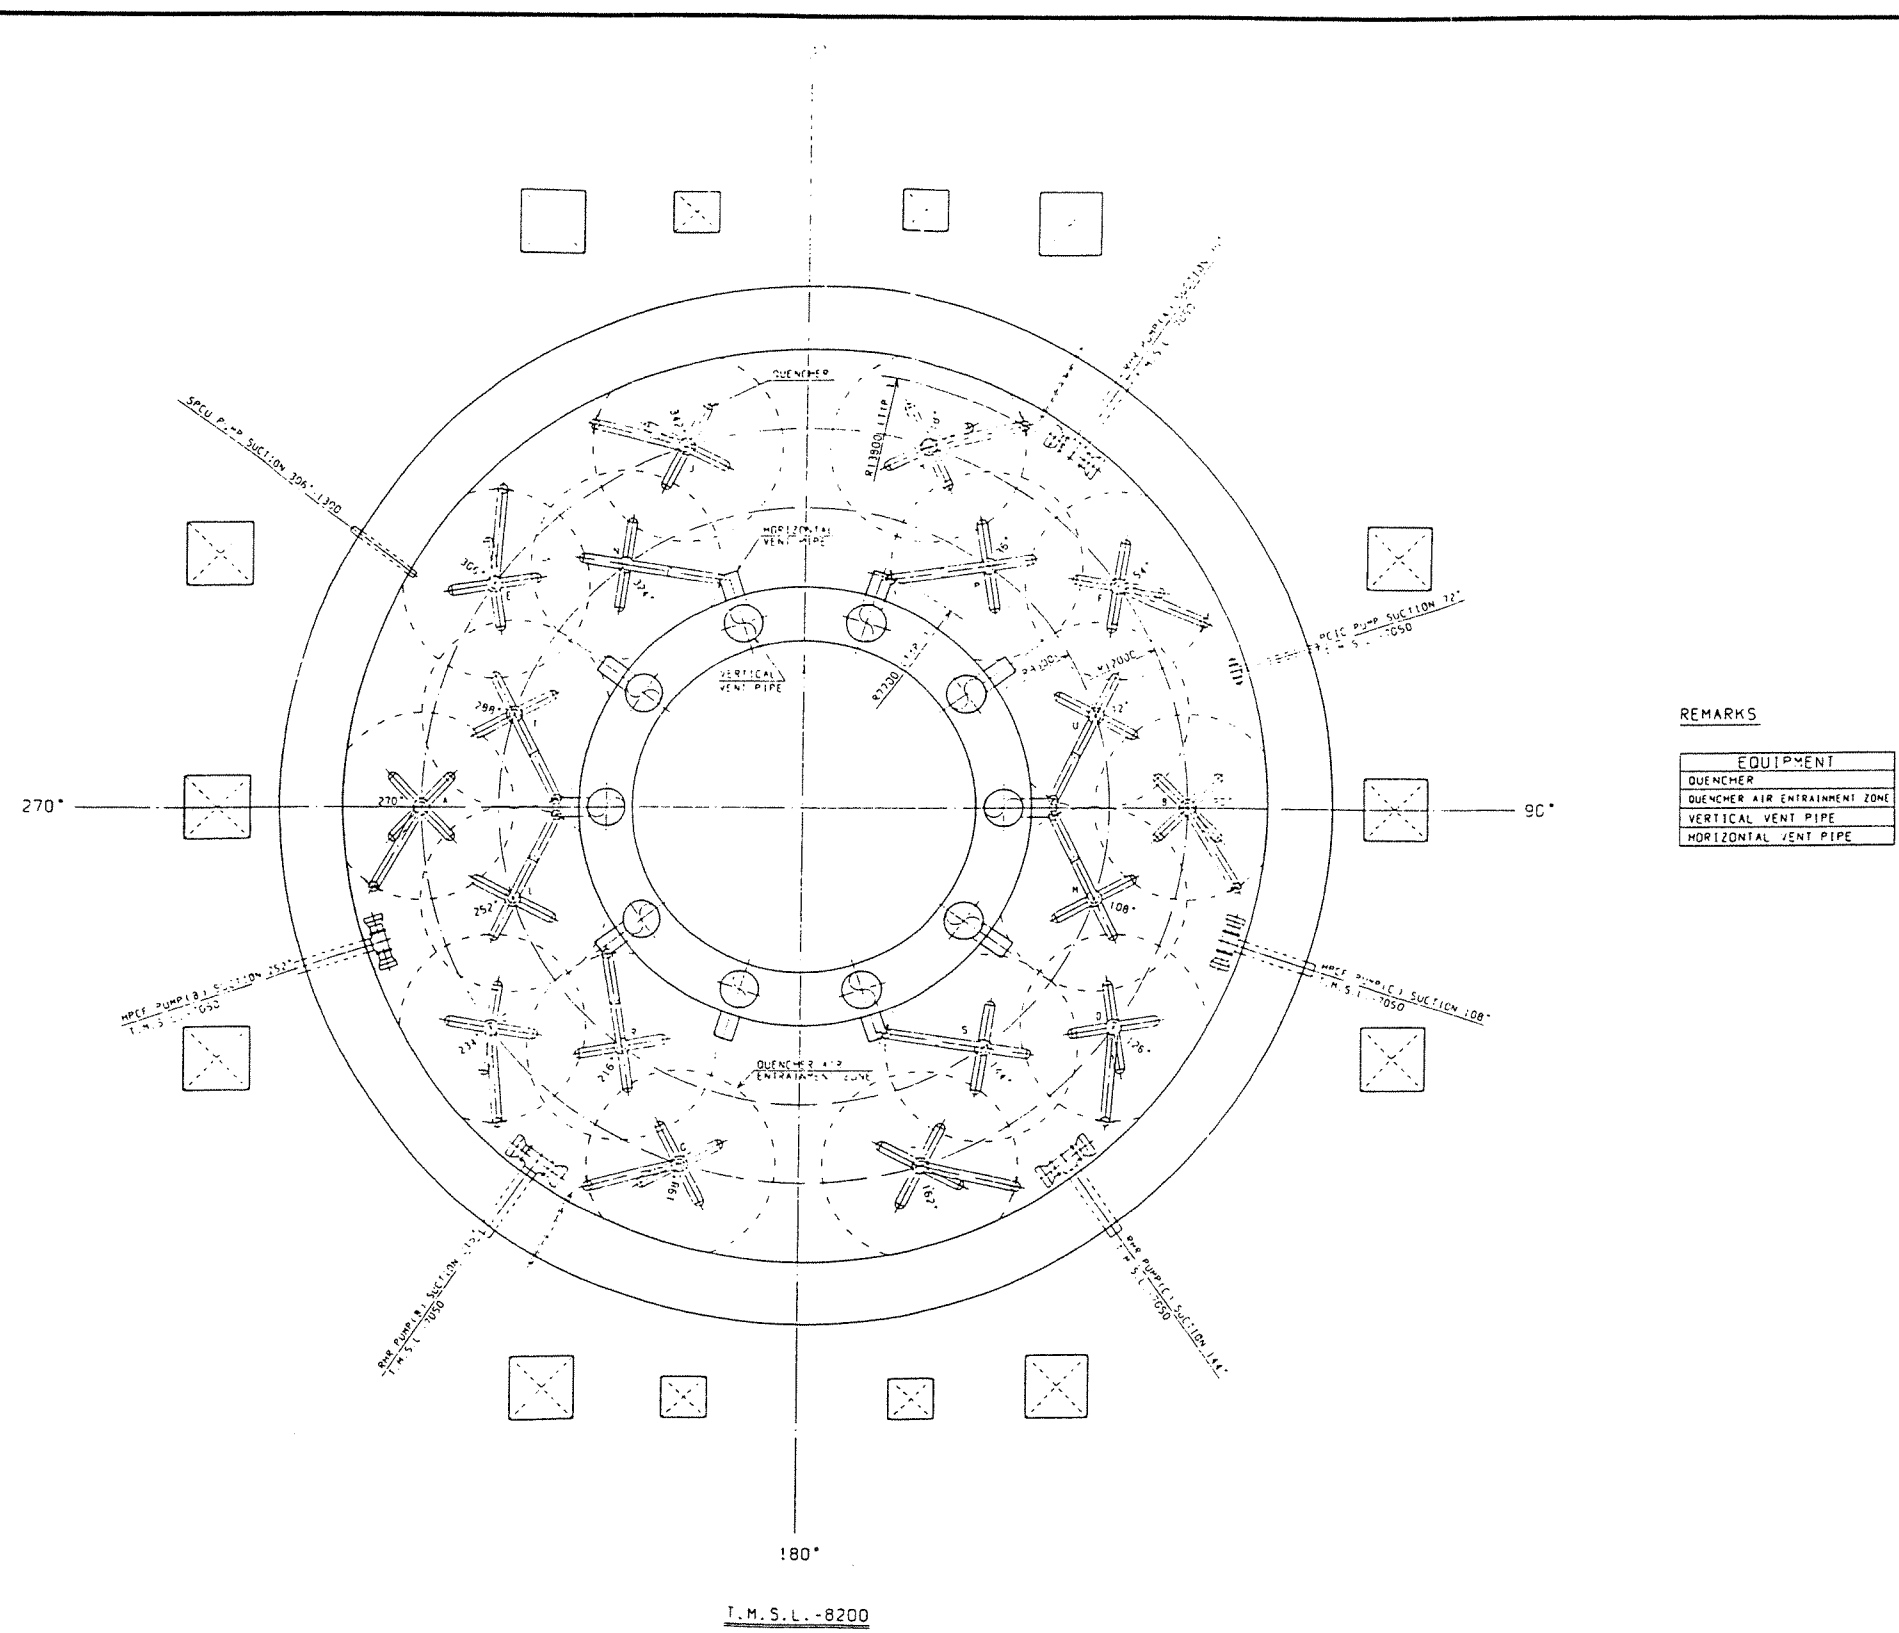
WETWELL, ARRANGEMENT PLAN AT EL. -8200 mm
